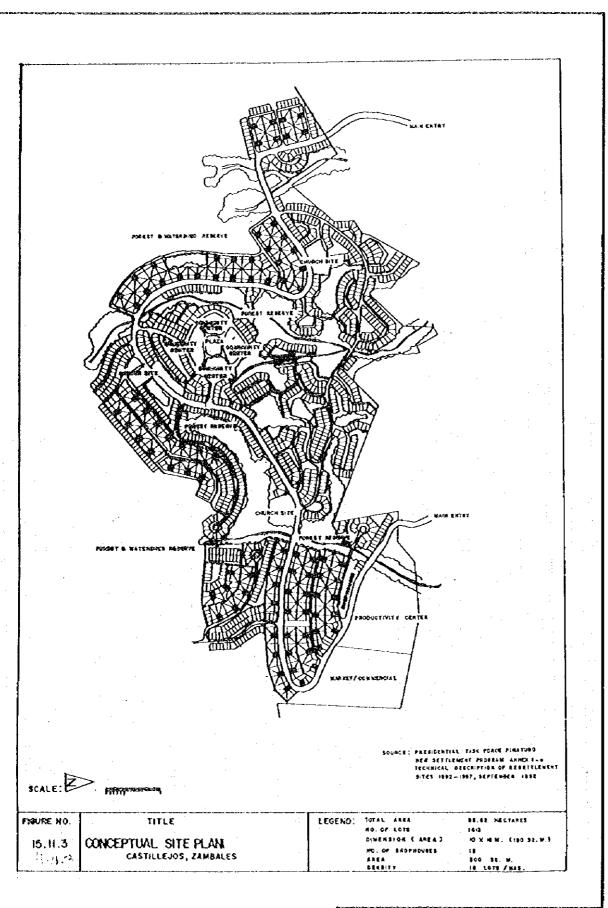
Conceptual Resettlement Site Plan (3/3)
